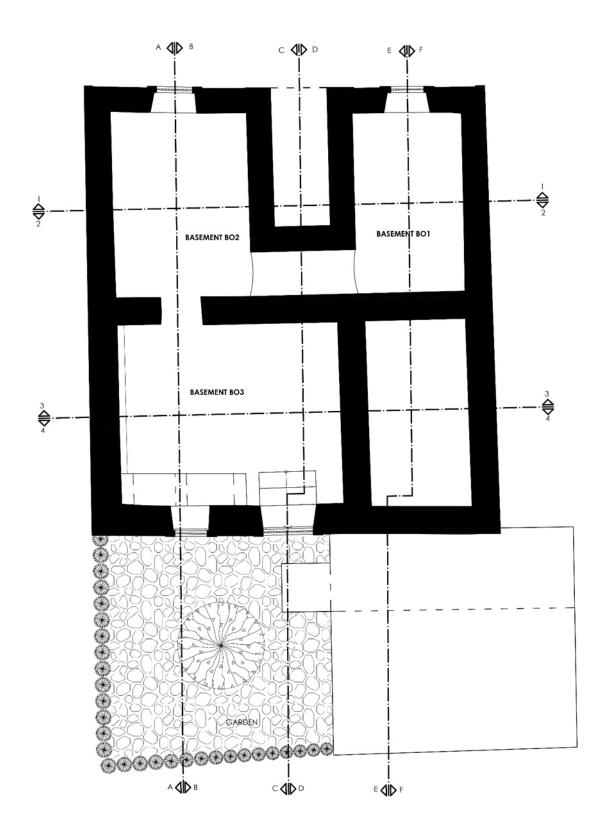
Basement floor plan of the house in Buca ((Başağaç, 2012)
